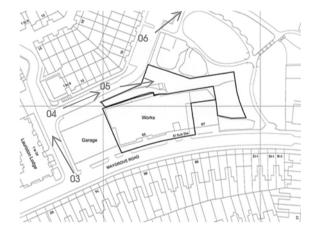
Approach from Maygrove looking up Barlow Rd entrance Photo 04 – Approach to rear of site onto Brassie Road from Barlow Road. Photo 05 – Existing Rear gates onto 65 Maygrove Road site Photo 06 – Rear housing types on Brassie Road circa 1970's The adjoining development at 59 Maygrove Road is one which we intend to focus on with regards to context. Its design attempts to make the best use of the limited space on the constrained site, providing 15 supported housing units and 14 properties for shared ownership. The principal building material chosen is brick – the dominant material in Victorian London, providing continuity with the surrounding architecture. As a low maintenance and durable material, it will mellow over time and further compliment adjacent properties.
